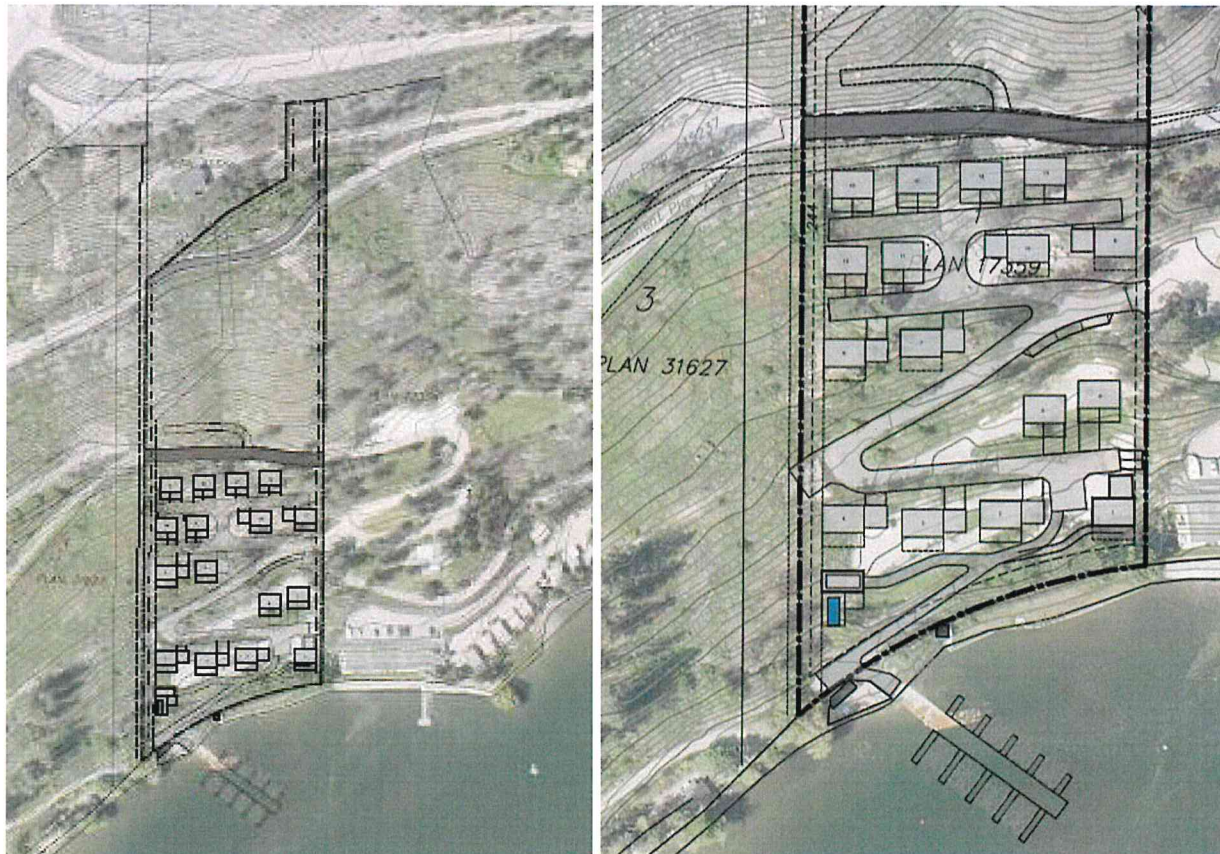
Conceptual Site Plan for 3060 Seclusion Bay Road
